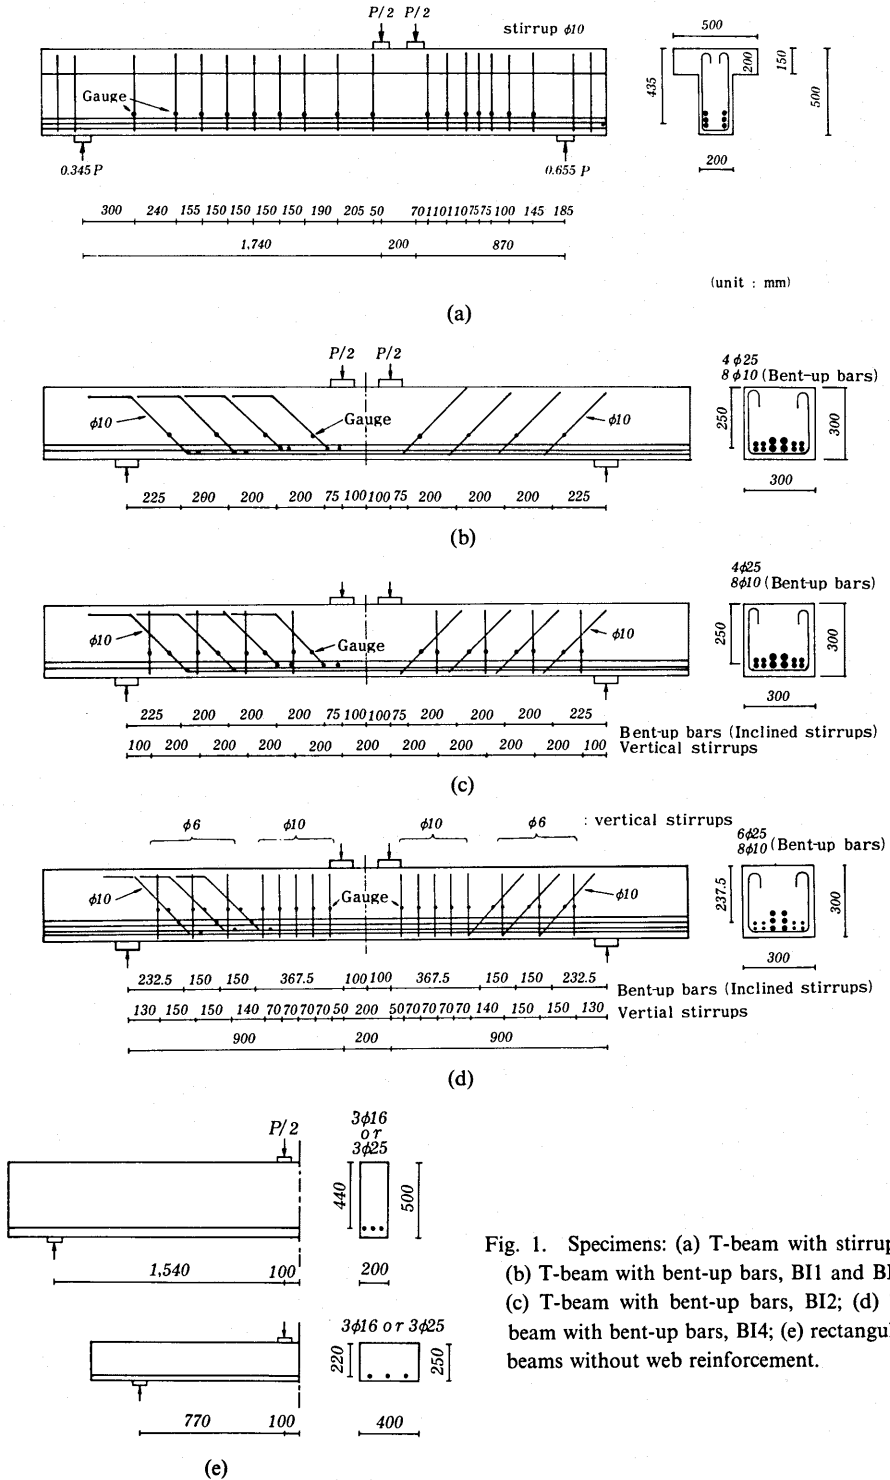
Specimens: (a) T-beam with stirrups; (b) T-beam with bent-up bars, BI1 and BI3; (c) T-beam with bent-up bars, BI2; (d) T-beam with bent-up bars, BI4; (e) rectangular beams without web reinforcement.
